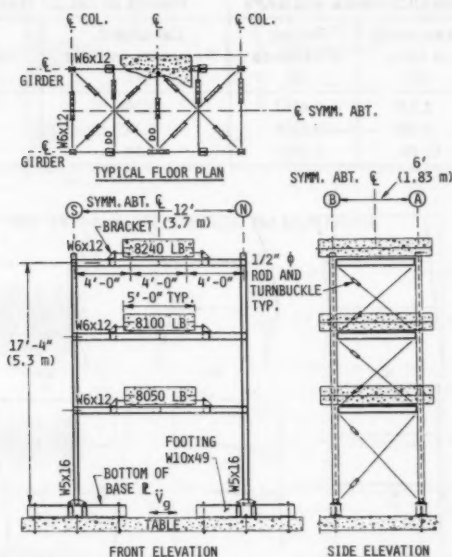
Plan and Elevations of UCB Test Structure (21)
